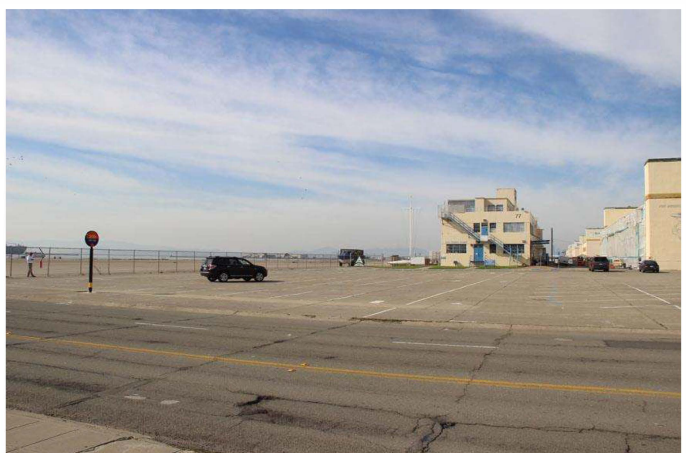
Project site, looking west from parking lot located east of Buildings 41 and 77
